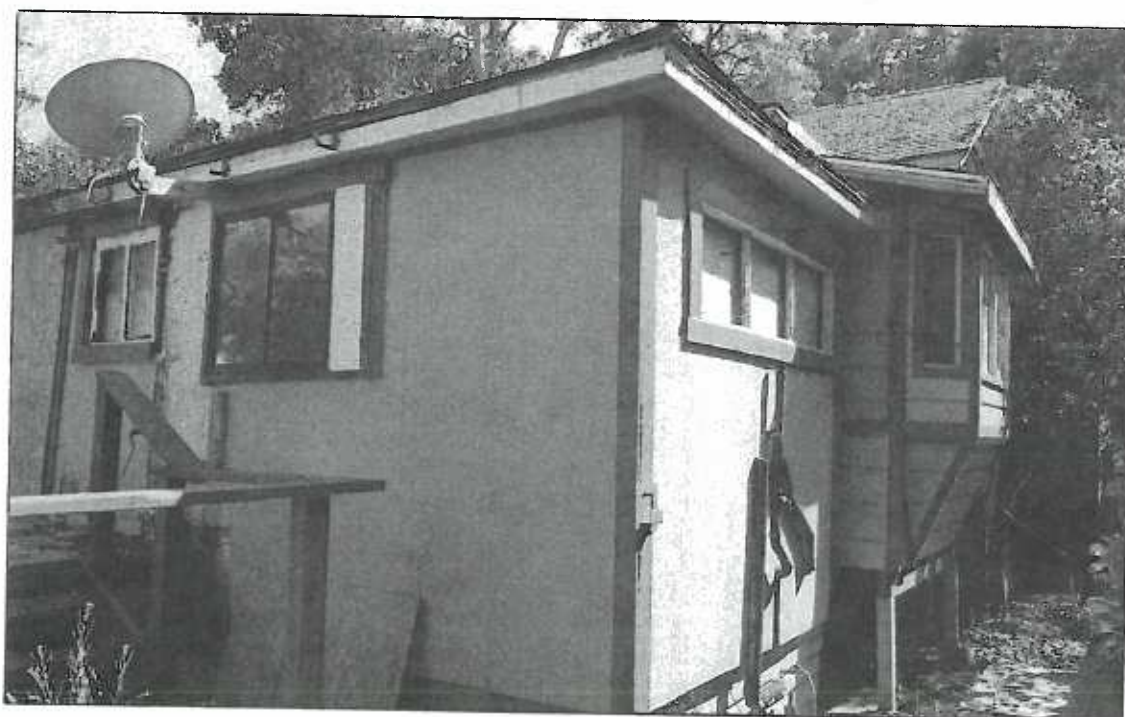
Looking southeast at north and west sides, 29 May 2018.
